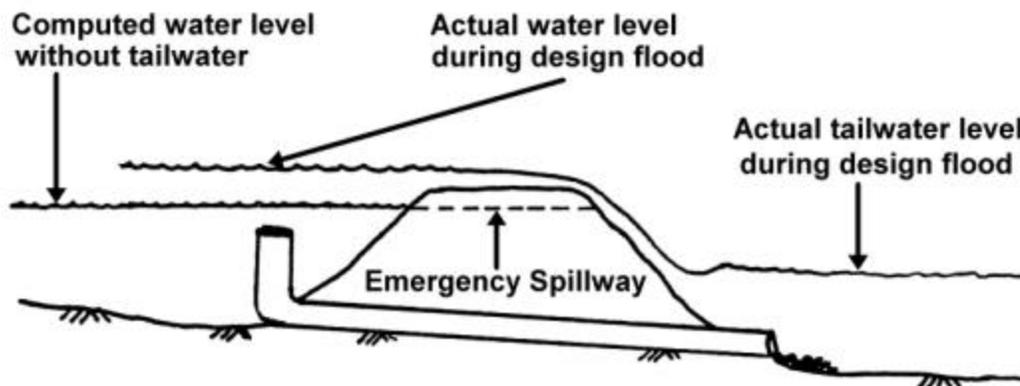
Impacts of Not Considering Tailwater Elevation
